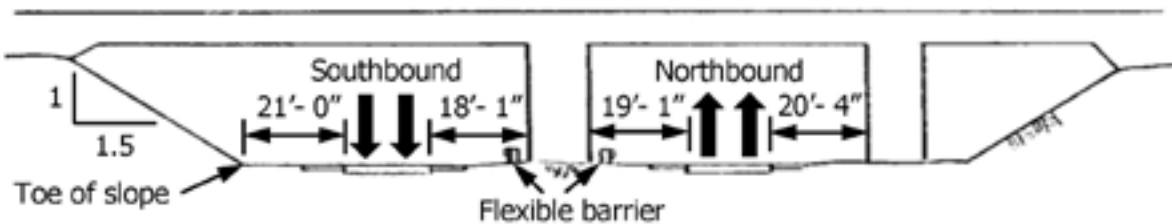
Bridge elevation view of horizontal clearances for separate southbound and northbound highway features below the bridge, with flexible barriers.
